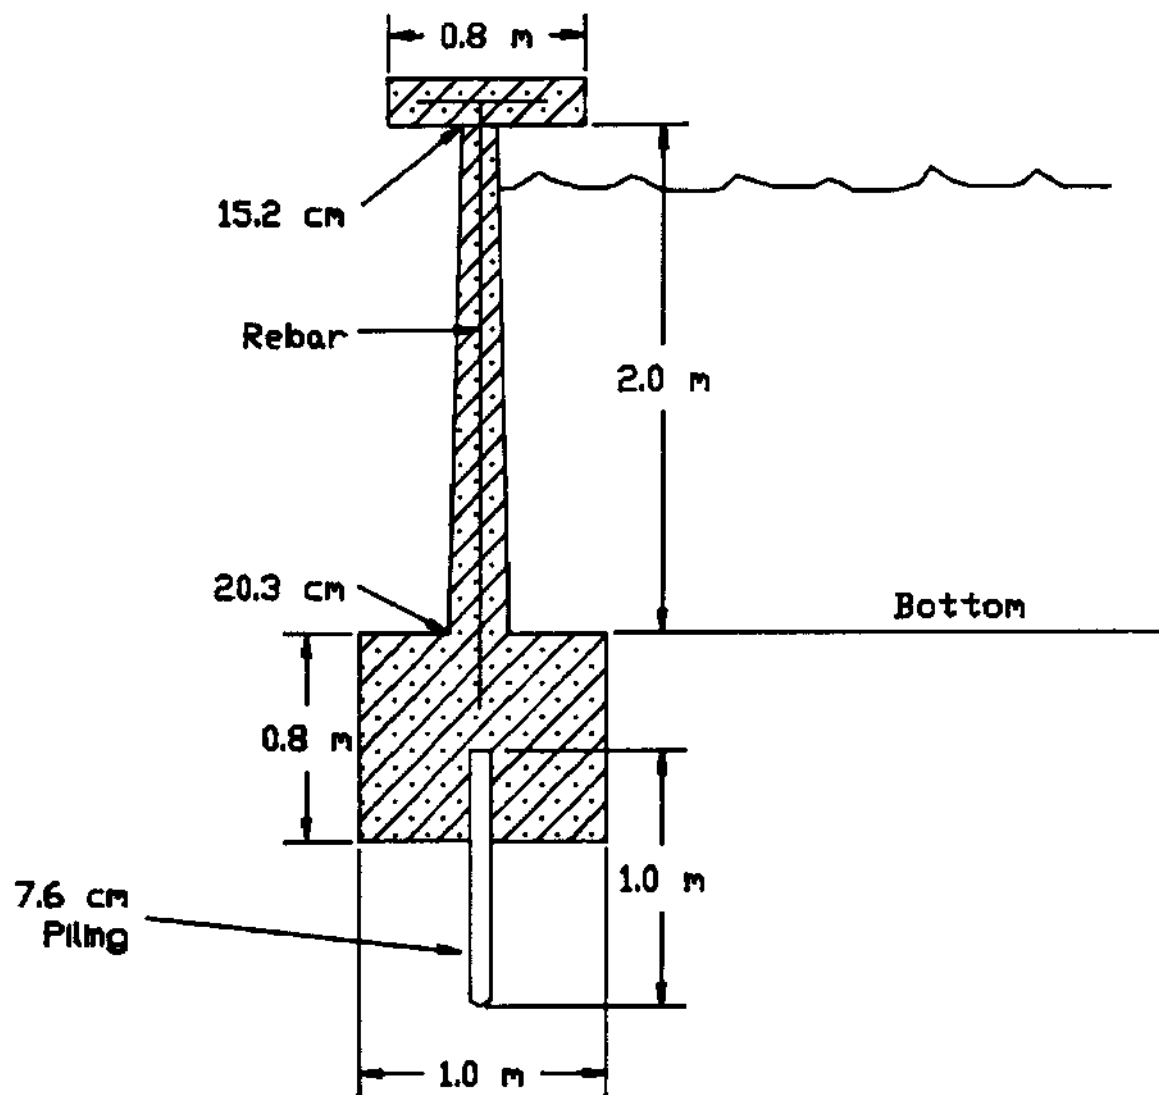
Cross-section of reinforced concrete pond wall at farm 1.
